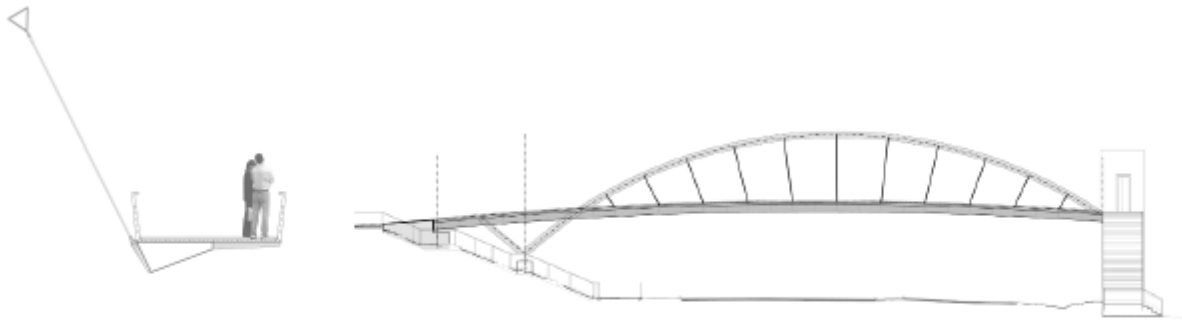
Sant Fruits Footbridge. Typical cross-section and elevation.
